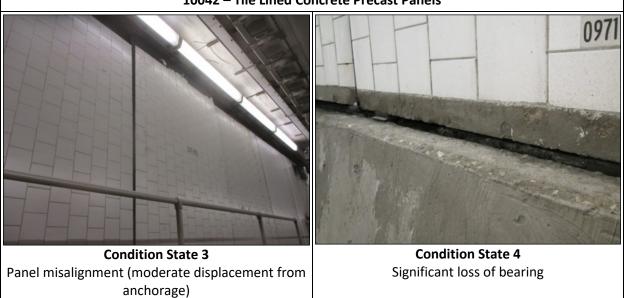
10042 – Tile Lined Concrete Precast Panels Condition Rating Example Photos
